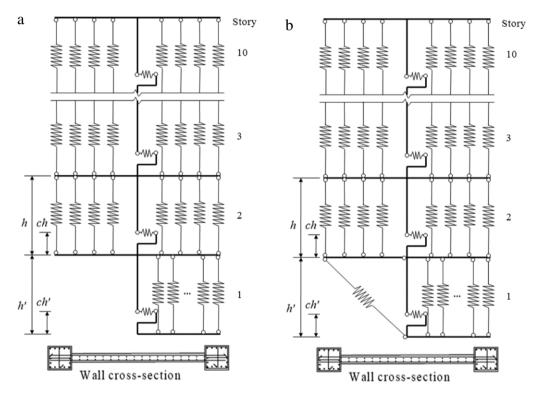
Simplified damaged shear wall models: (a) Model B and (b) Model C.
